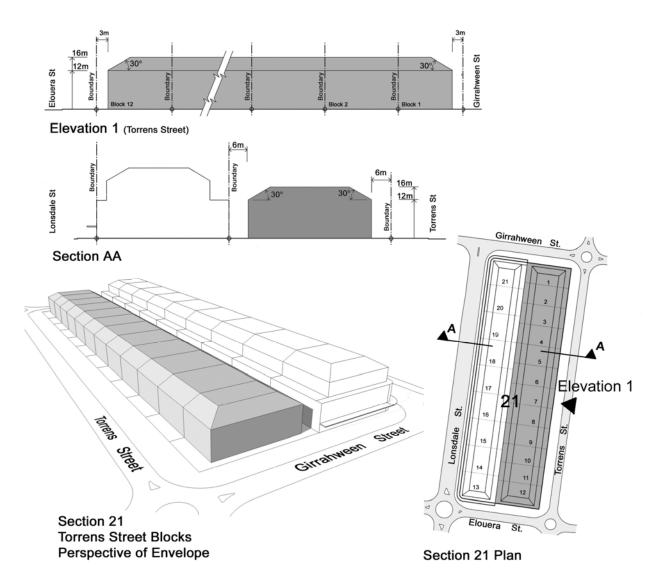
Building Envelope Diagram - Braddon Section 21 Blocks 1- 12 (CZ2 Zone)
